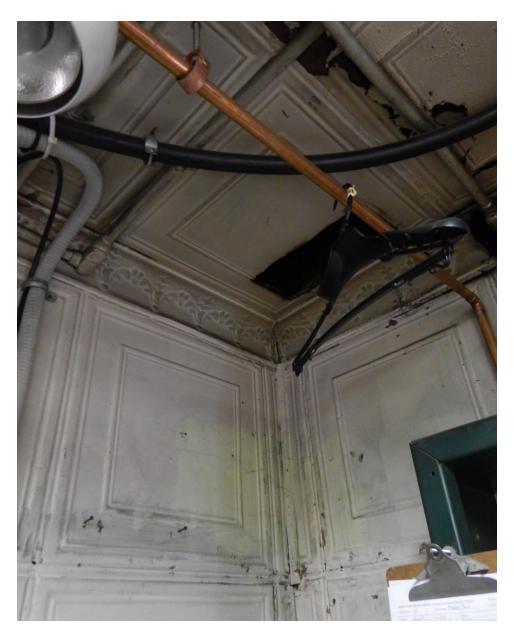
FIRST FLOOR TIN WALL AND CEILING DETAIL
